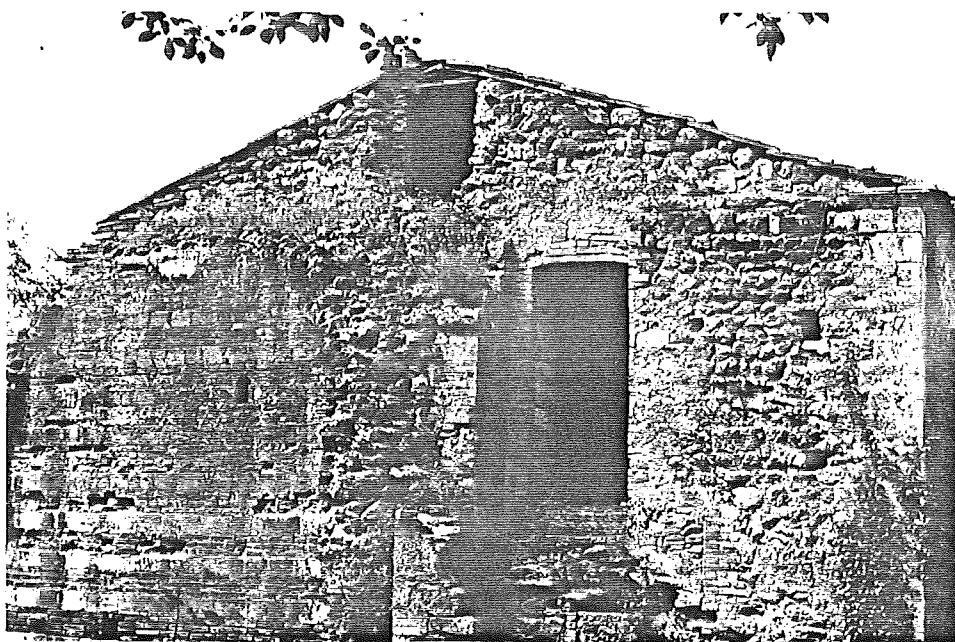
South facade of casa colonica showing gable roof, second floor entrance, location of a former staircase, and remains of the north apse wall of the third church of Santa Lucia (Appendix C, BUILDING PLAN, No. 11).
